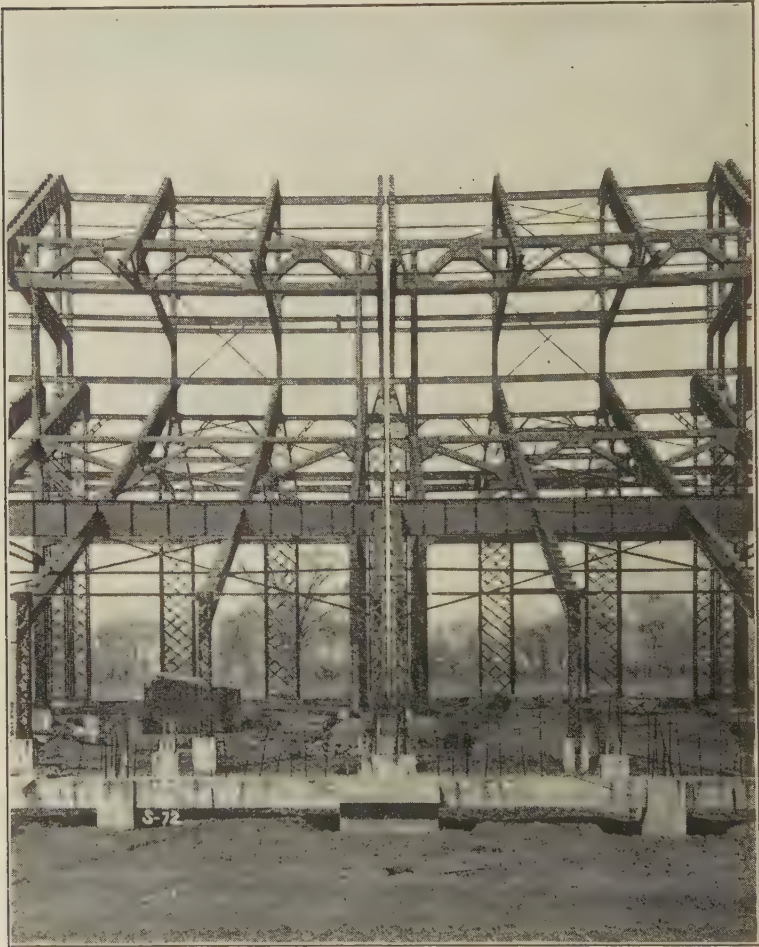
STEEL FRAME AT EXPANSION JOINT.
